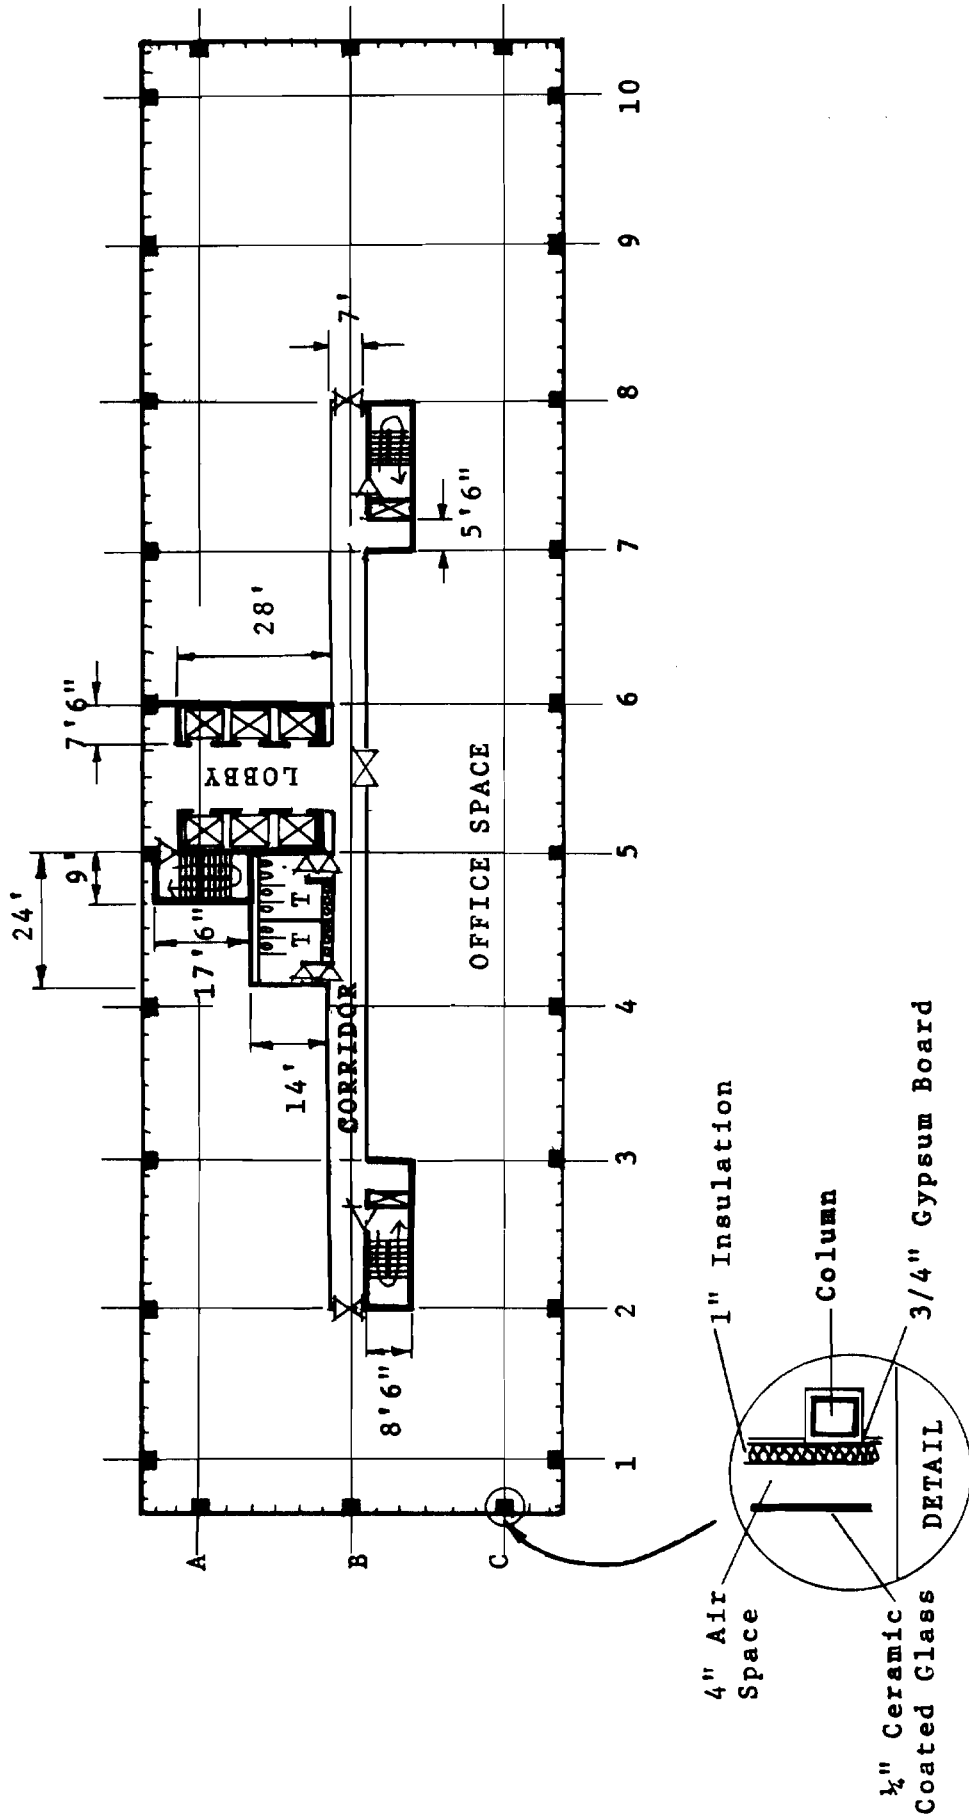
TYPICAL FLOOR PLAN & WALL SECTION
